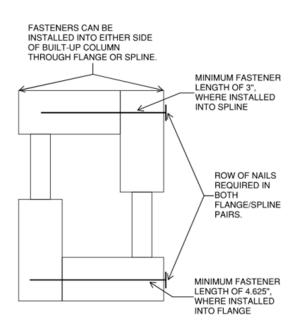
BARENAKED TSTUD™ BUILT-UP COLUMN DETAILS WITH 2X4 FLANGE
